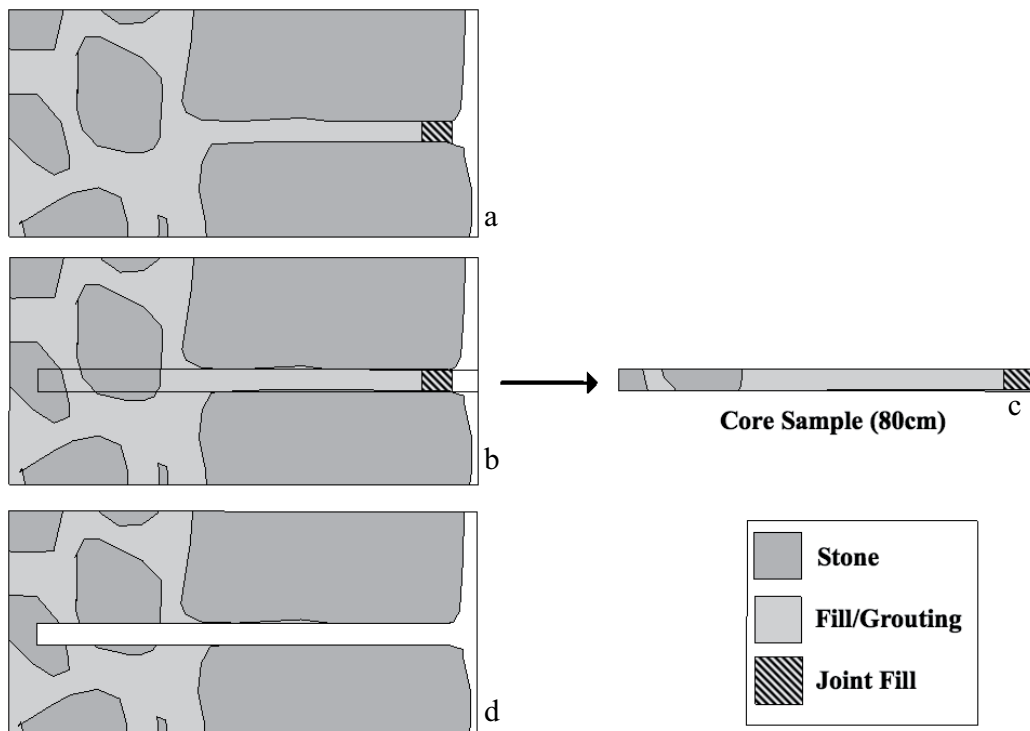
Core Drilling. Section Detail. a) Before, b) Path of the Core Drill Bit, c) Core Sample, and d) After Core Drilling.
